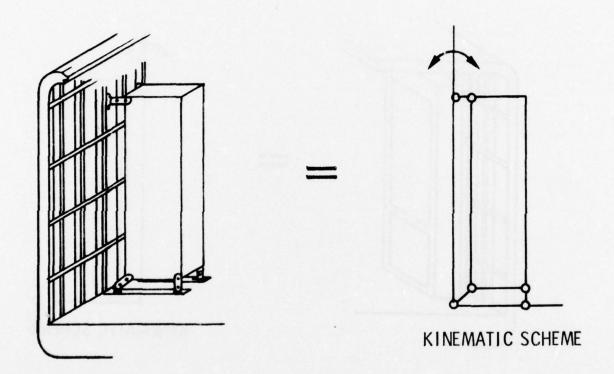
Mounting Scheme for Pier Racks in a Rectangular Fuselage
